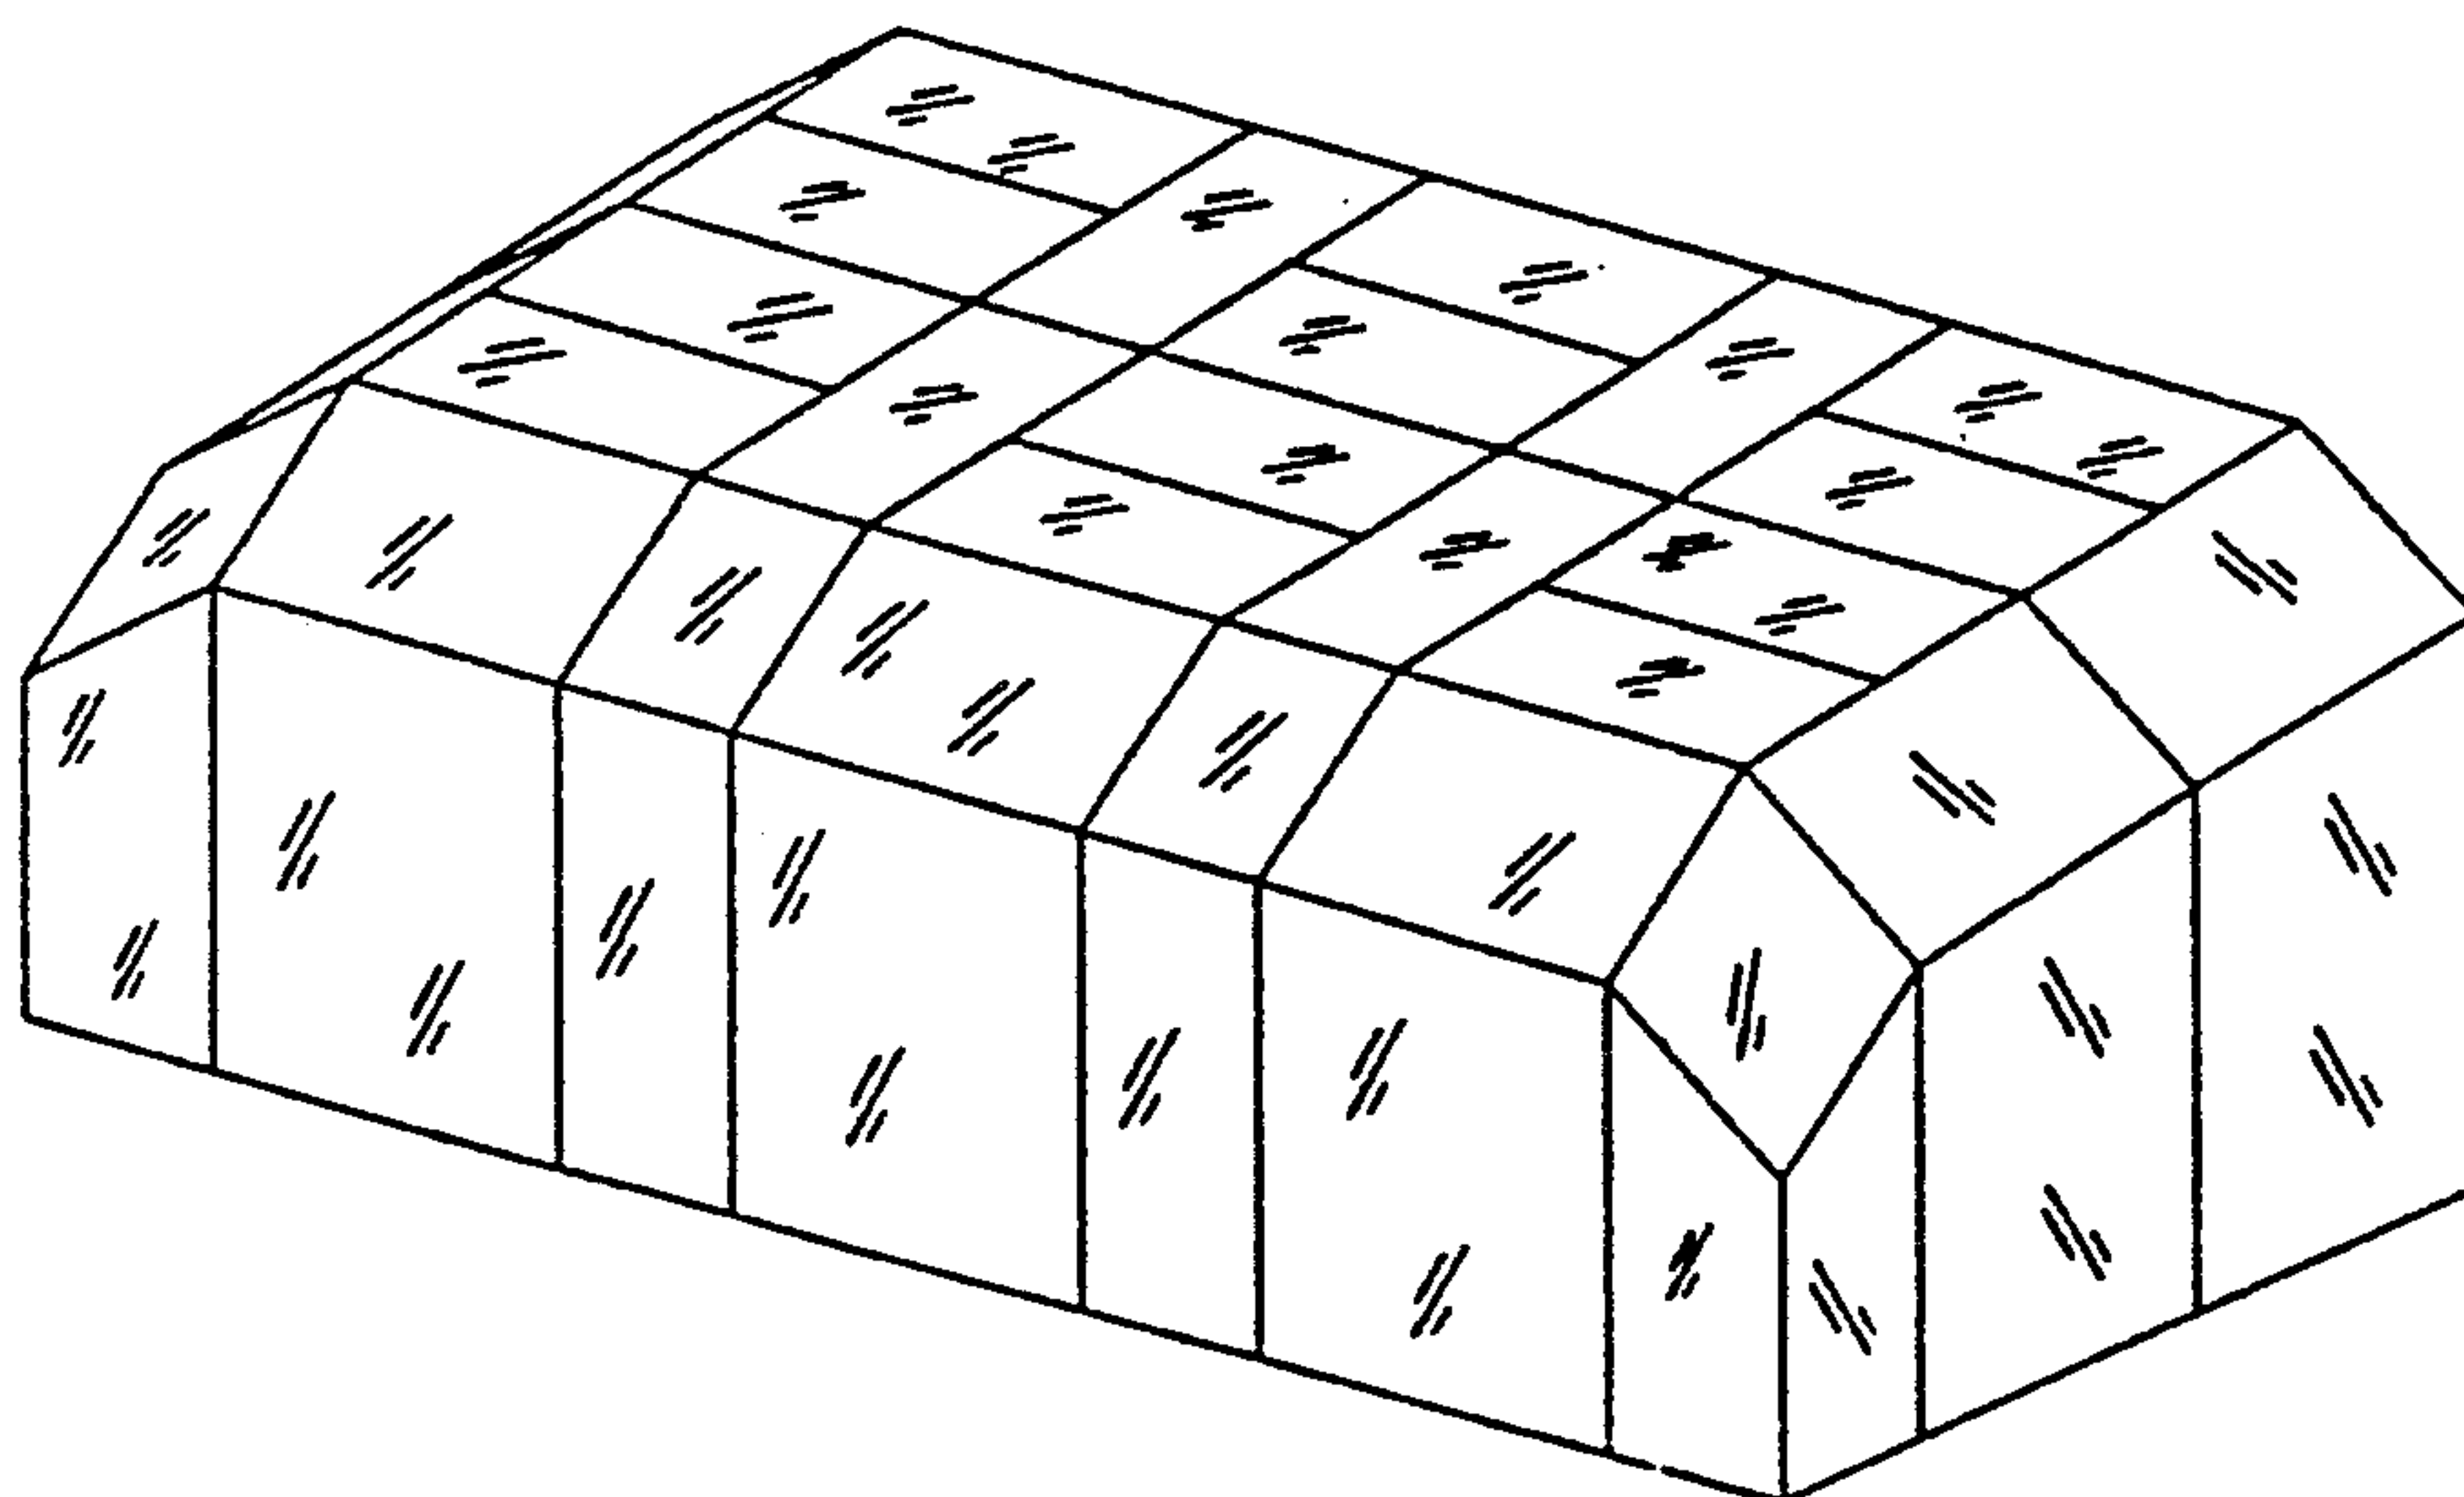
is a front, top, right side perspective view of an eighth embodiment, the left side being a mirror image of the right;
